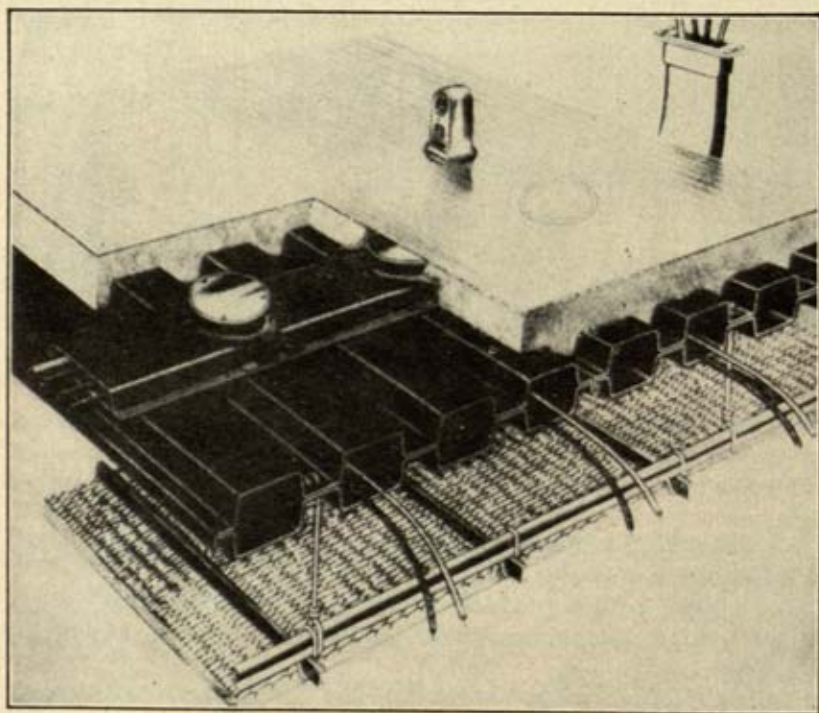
Typical section of a floor system using cellular-steel units. (H. H. Robertson Company.)
